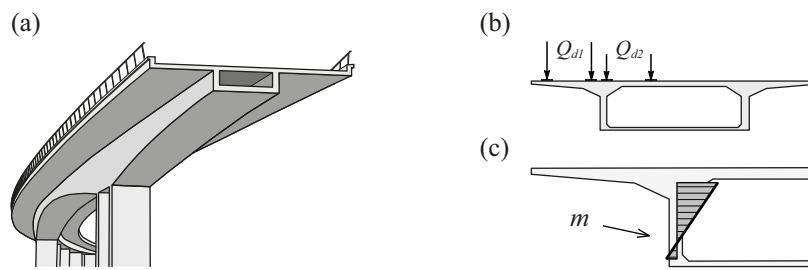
Interaction of in-plane shear and transverse bending in the webs of (a) box-girder bridges; (b) transverse cross section with typical traffic load; (c) transverse bending moment in the web.
